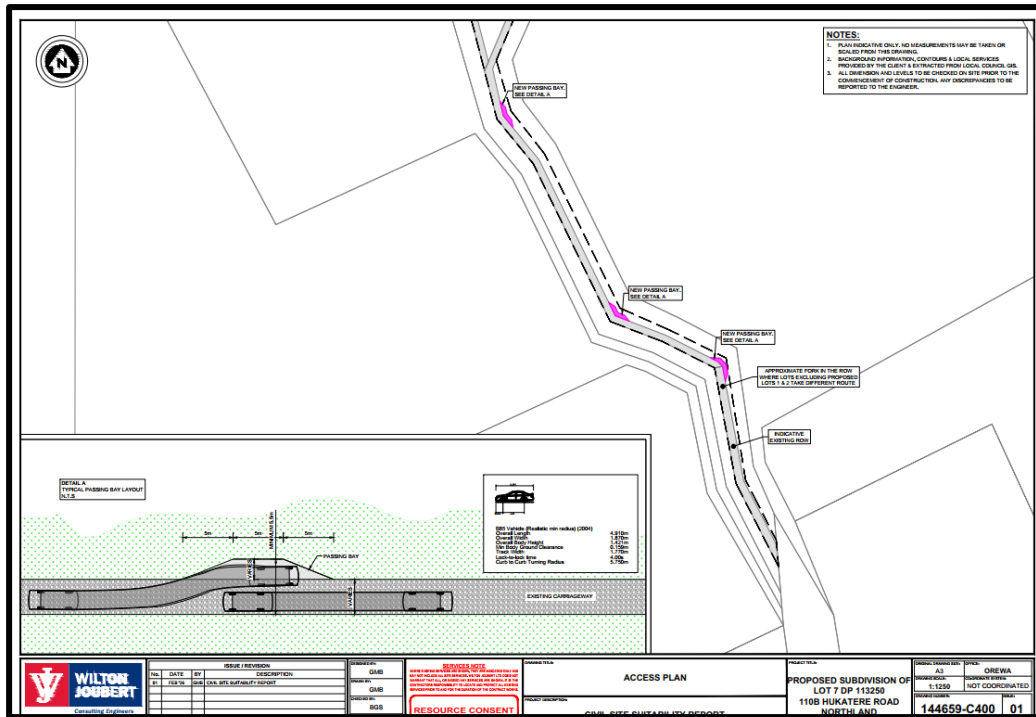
Wilton Joubert's indicative passing bay locations along the proposed right of way easement.
